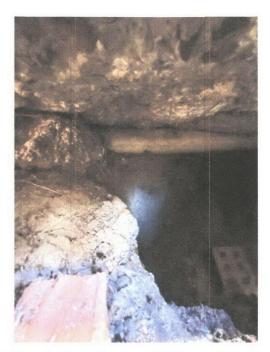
View of void eroded below neighbouring carport showing undermined PVC pipe near surface
